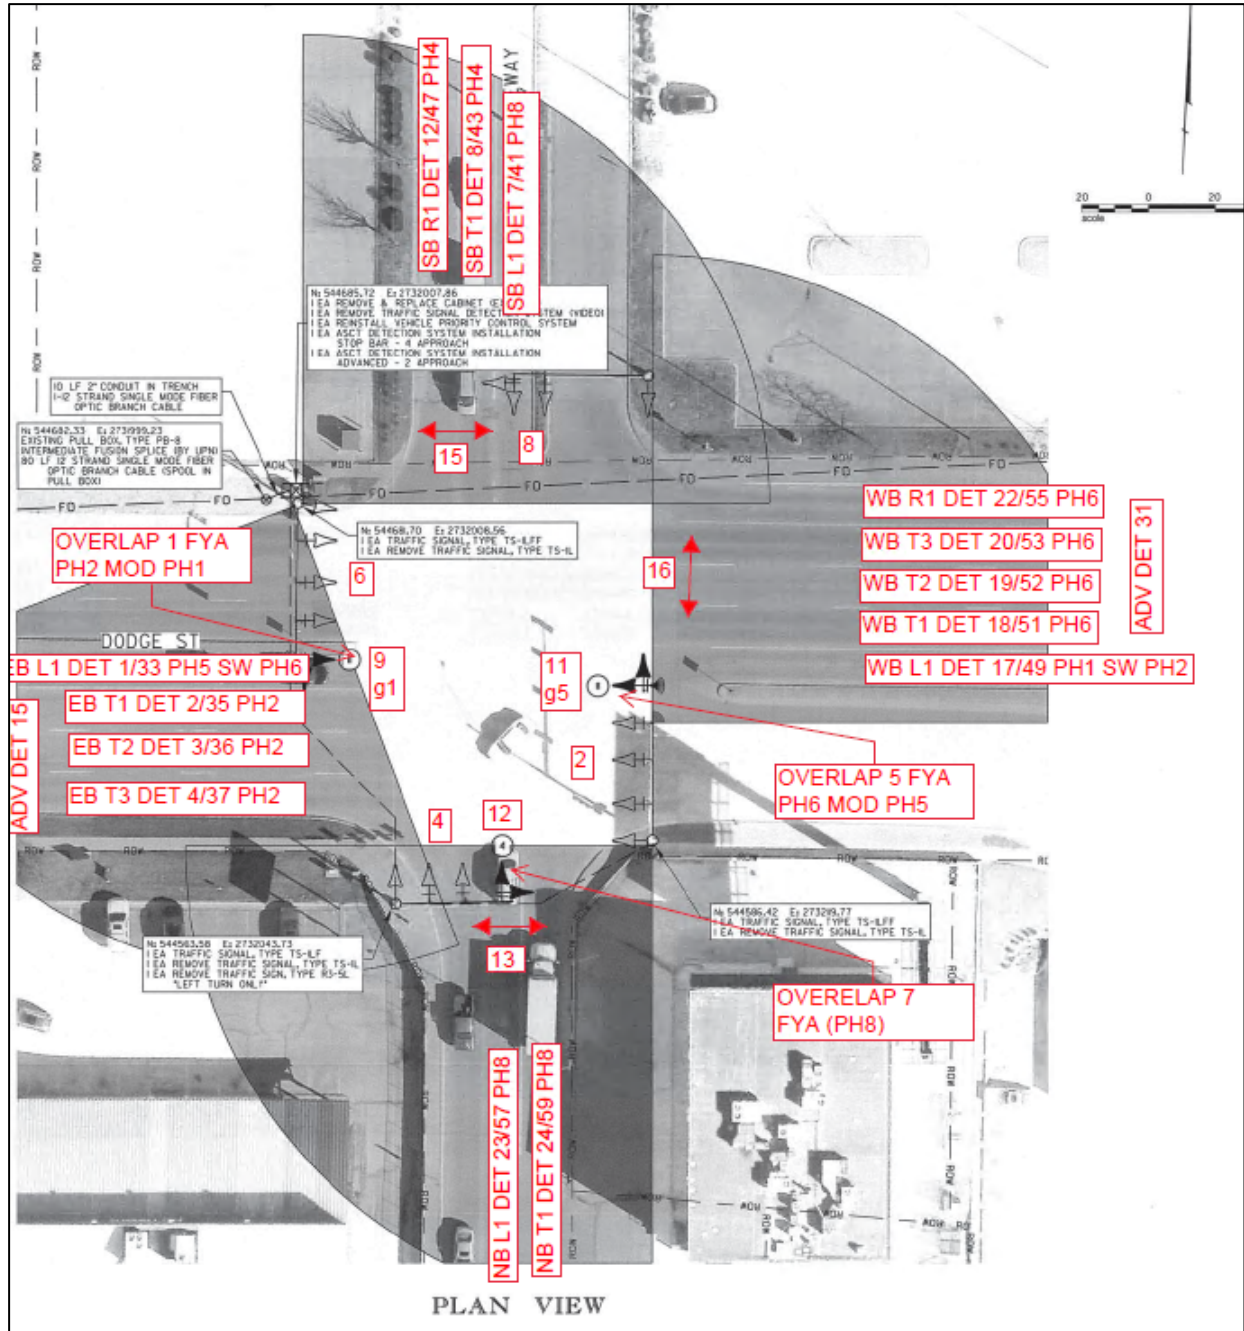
Intersection plan sheet with detector configuration for Dodge Street and 74th Street, Omaha
